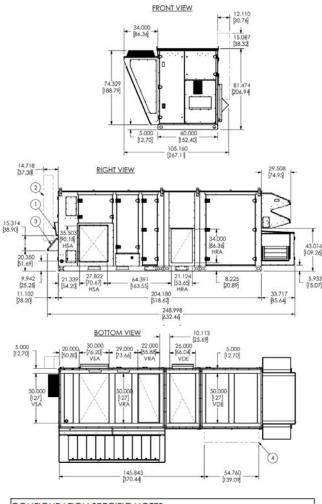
Unit dimensional data for OAK 12 to 30 tons, horizontal supply and horizontal return with optional exhaust fan (dual dimensions, in. [cm])
